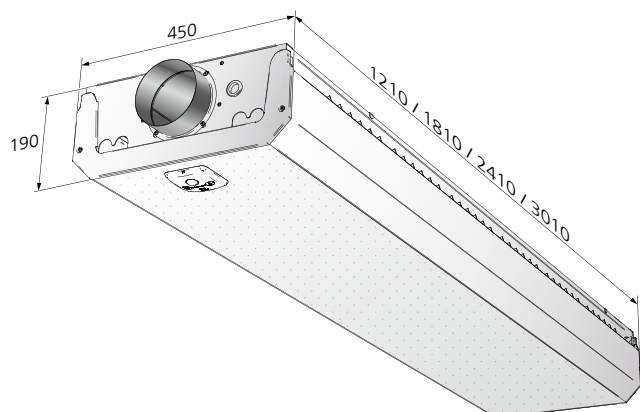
Dimensions – ADRIATIC AWC Prisma
